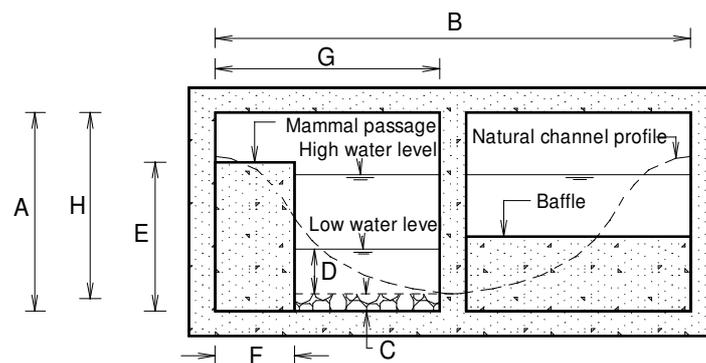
Schematic cross-section of culvert, showing key geometric parameters
